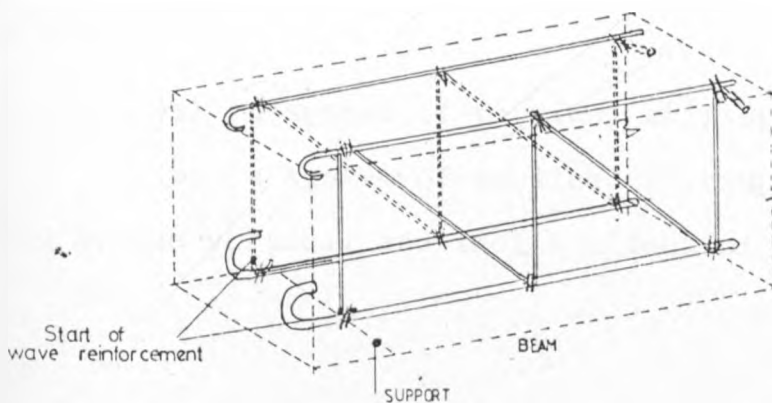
CAGE WITH WAVE REINFORCEMENT
